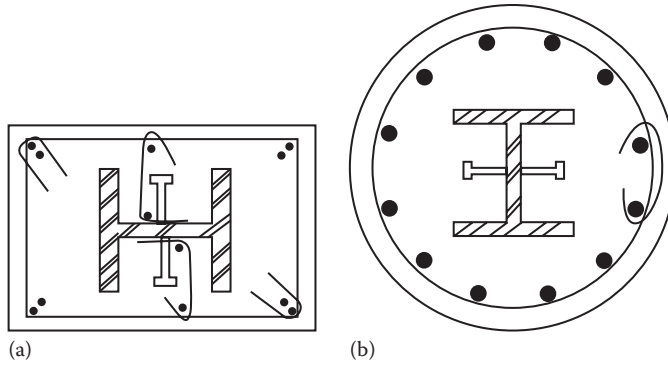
Seismic tie-arrangement in composite columns: (a) rectangular column; (b) circular column.
